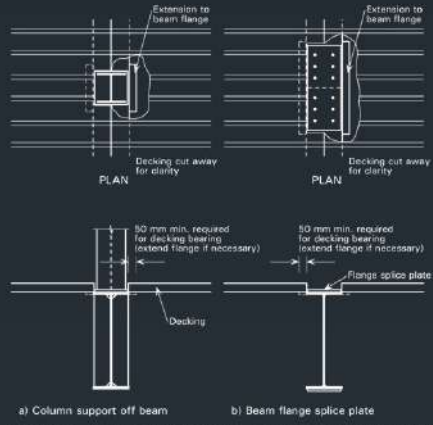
Decking details where a column is supported off a beam and where a beam flange plate occurs
